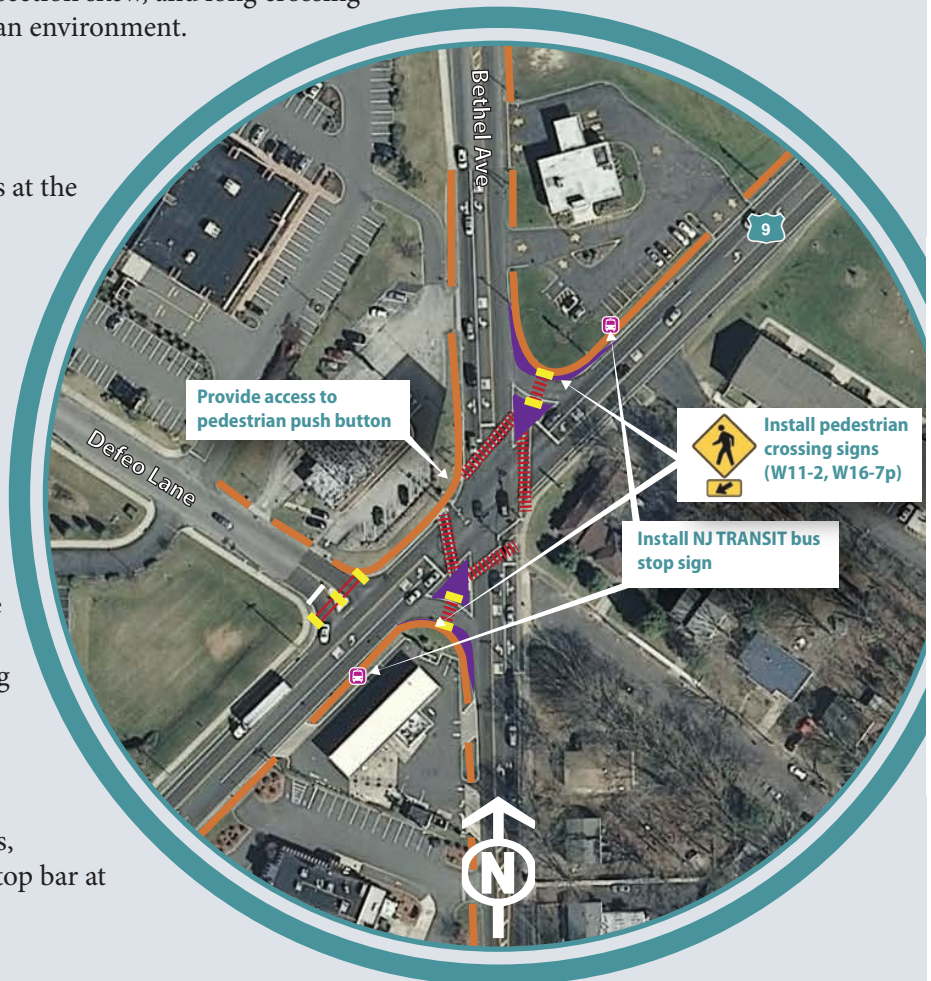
| U.S. Route 9 (New Road) at Bethel Road
